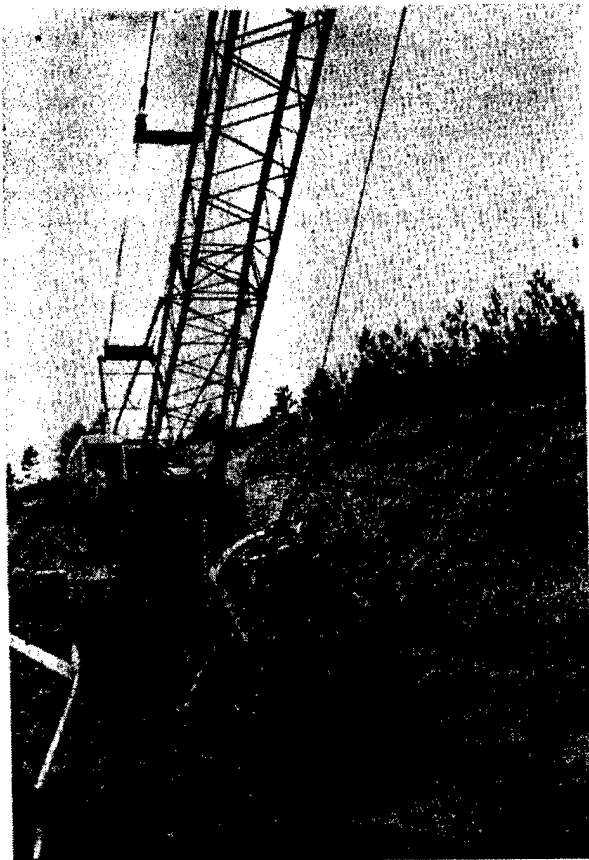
Dragline excavation of slurry trench, West Point Dam, Georgia
